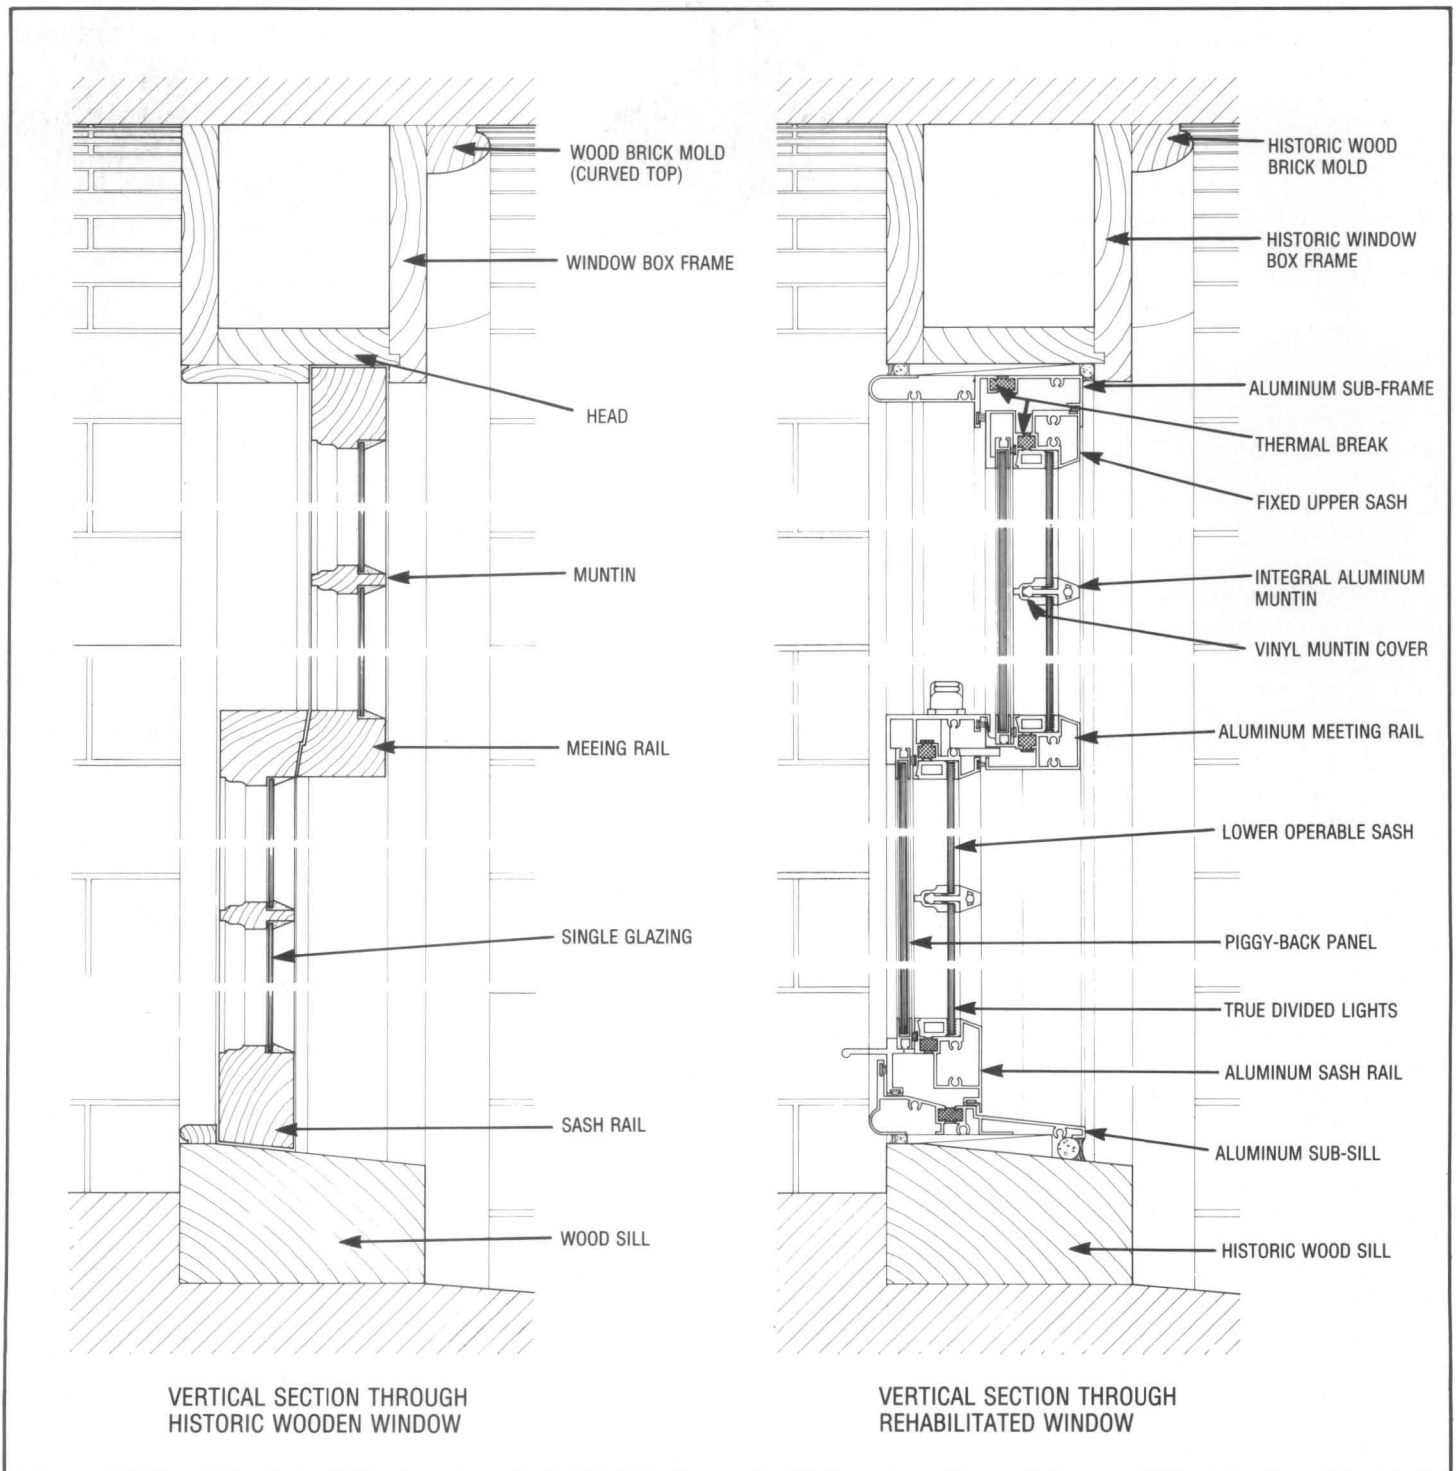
Vertical section of the window shown with old and new sash. Drawing: Timothy Buehner
